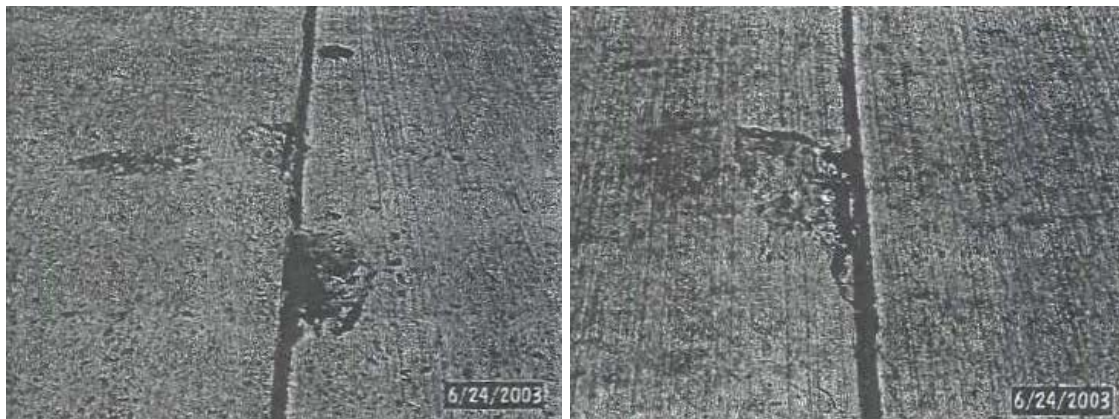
Example of spalling at concrete joint (GDOT 2003)
